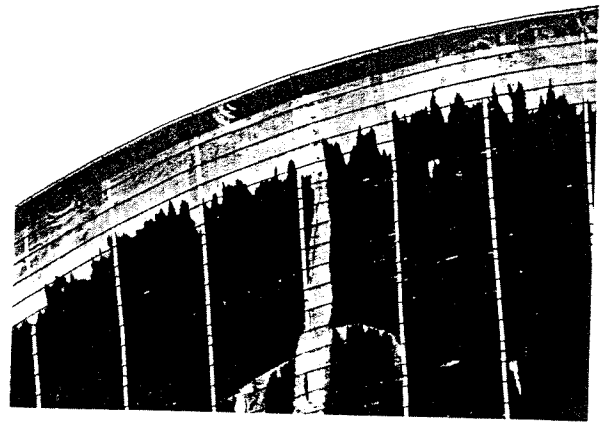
Circumferential external prestressing using Parafil ropes at the top of a cooling tower at Thorpe Marsh Power Station. (Courtesy of Central Electricity Generating Board)
